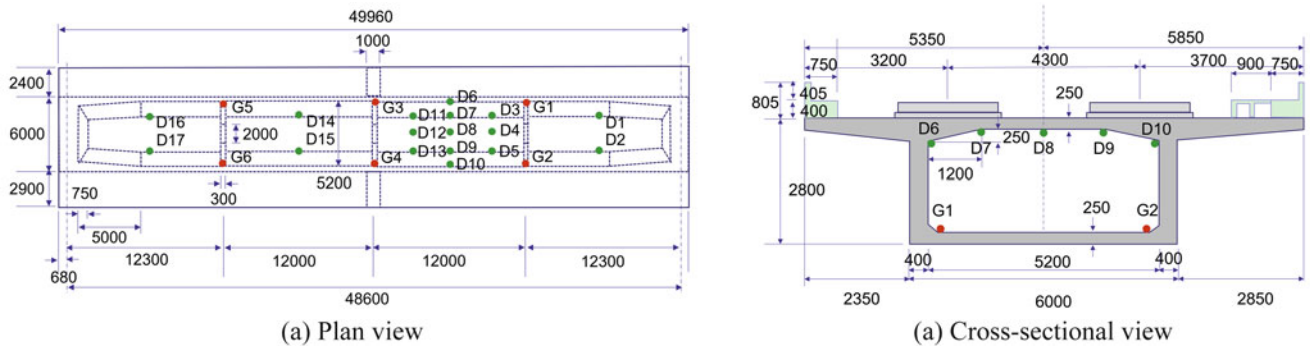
Target bridge and measurement setup. (a) Plan view. (b) Cross-sectional view
